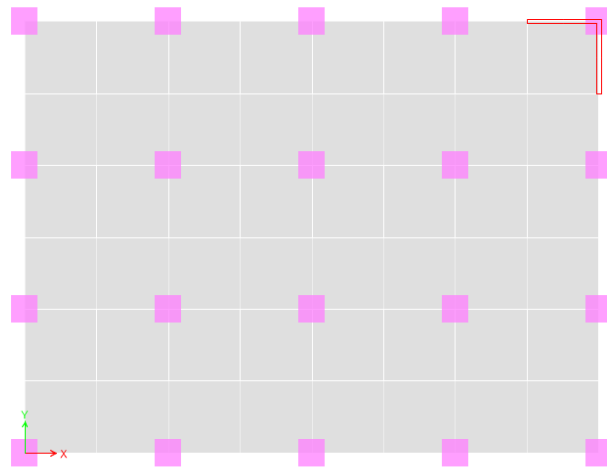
2D plan of 8th story rectangular shape building case SW6
